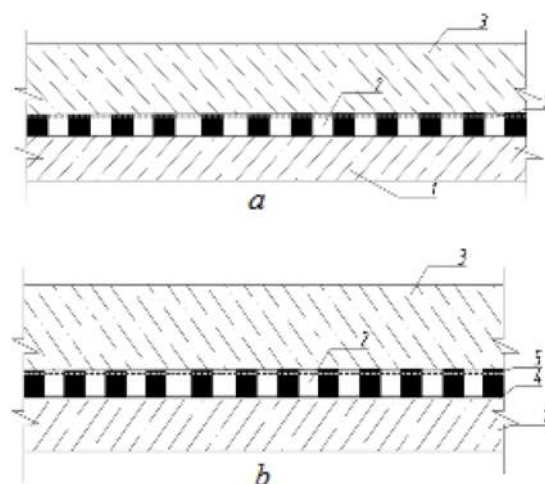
Seamless waterproofing of a tray (foundation) slab with sprayed compounds with double-sided adhesion: a – without underlying layer; b – with underlying layer of nonwoven geotextile; 1 – concrete preparation; 2 – waterproofing layer; 3 – tray slab; 4 – underlying layer of nonwoven geotextile; 5 – nonwoven geotextile reinforcing the surface layer of the waterproofing coating.
